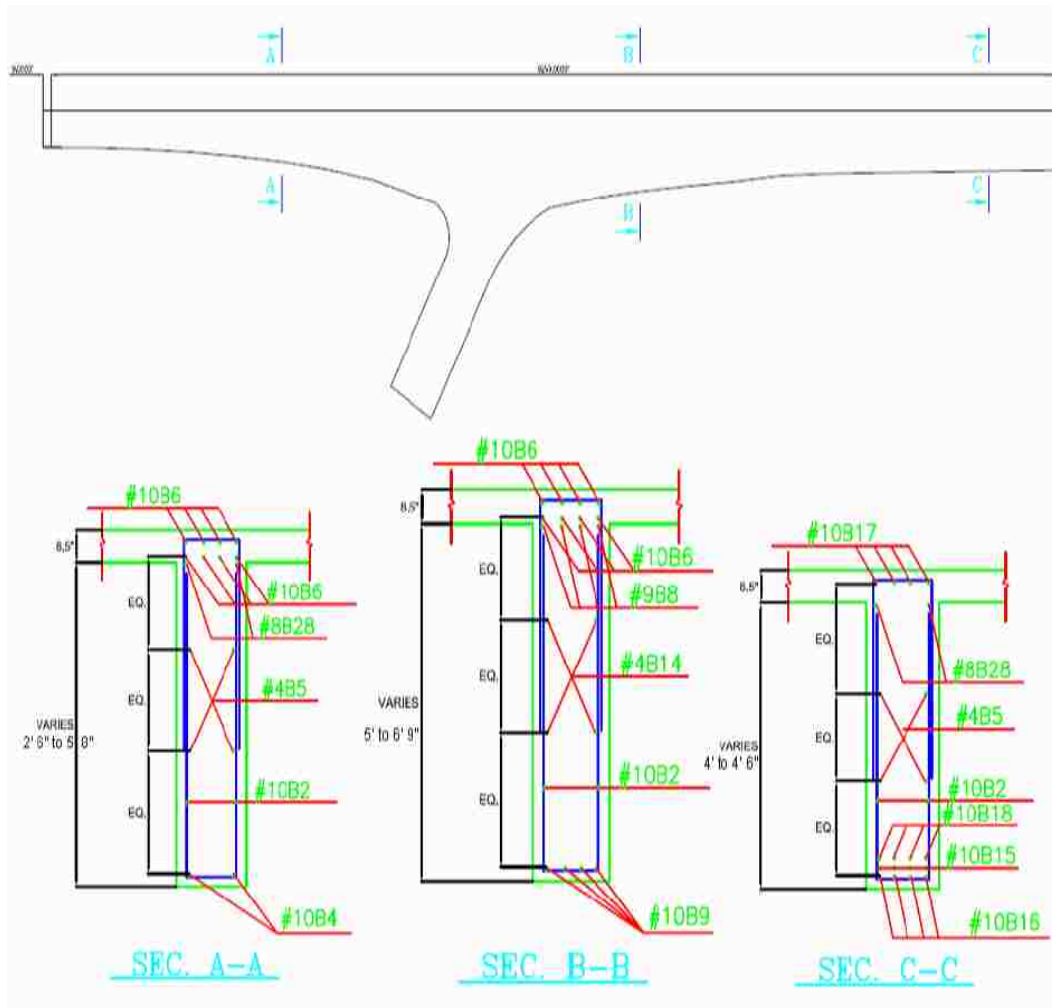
Schematic of as built structural drawing of Bridge 7937.
